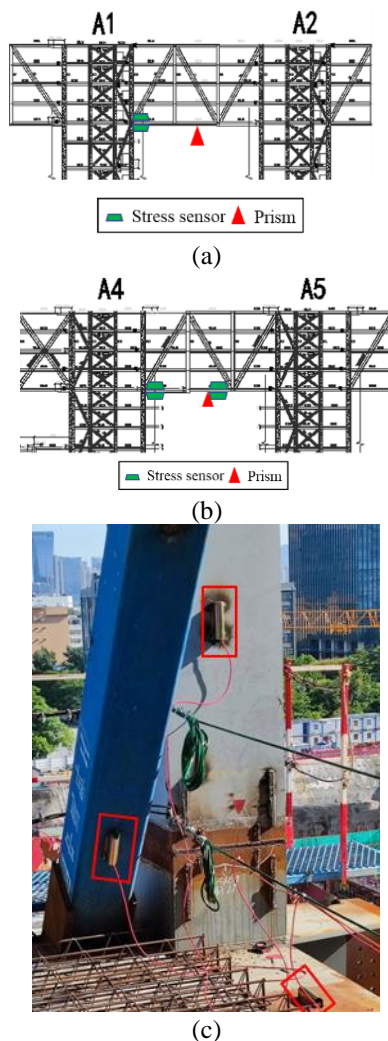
Stress sensors and Prisms on truss. (a) truss between A1-A2, (b) truss between A4-A5 and (c) sensor installation diagram (in red box)
